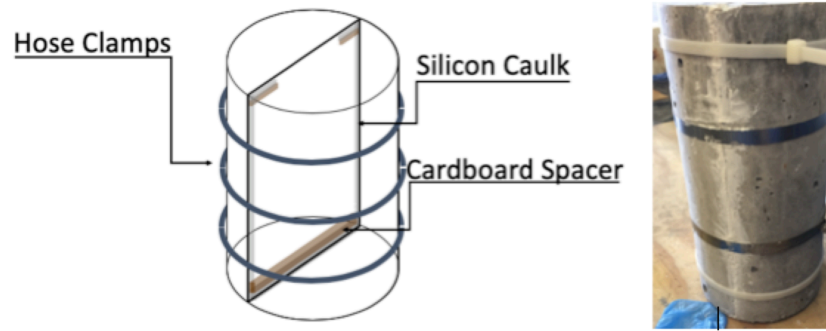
HMWM-repaired concrete specimens used in the uniaxial compression tests.
